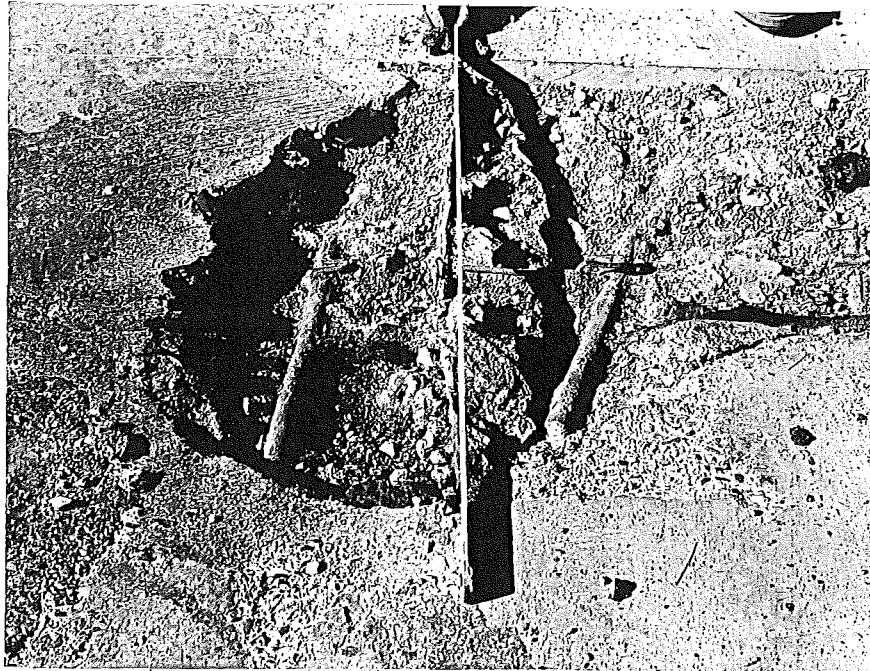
View showing horizontal misalignment of two dowels next to center joint.
